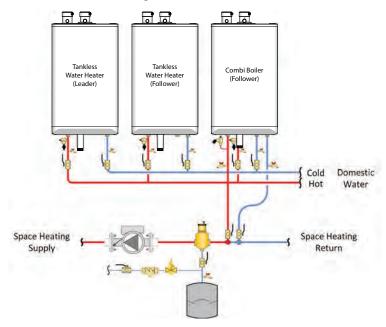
Typical Tankless Water Heater and Combi Boiler cascade piping – concept drawing. This drawing is only a simple schematic guide
